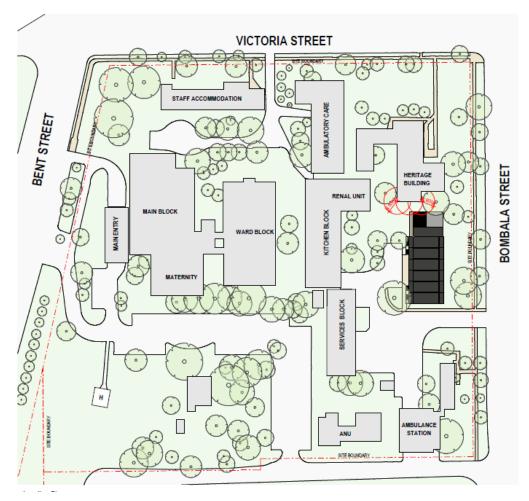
Site layout (proposed development adjacent to Bombala Street)
